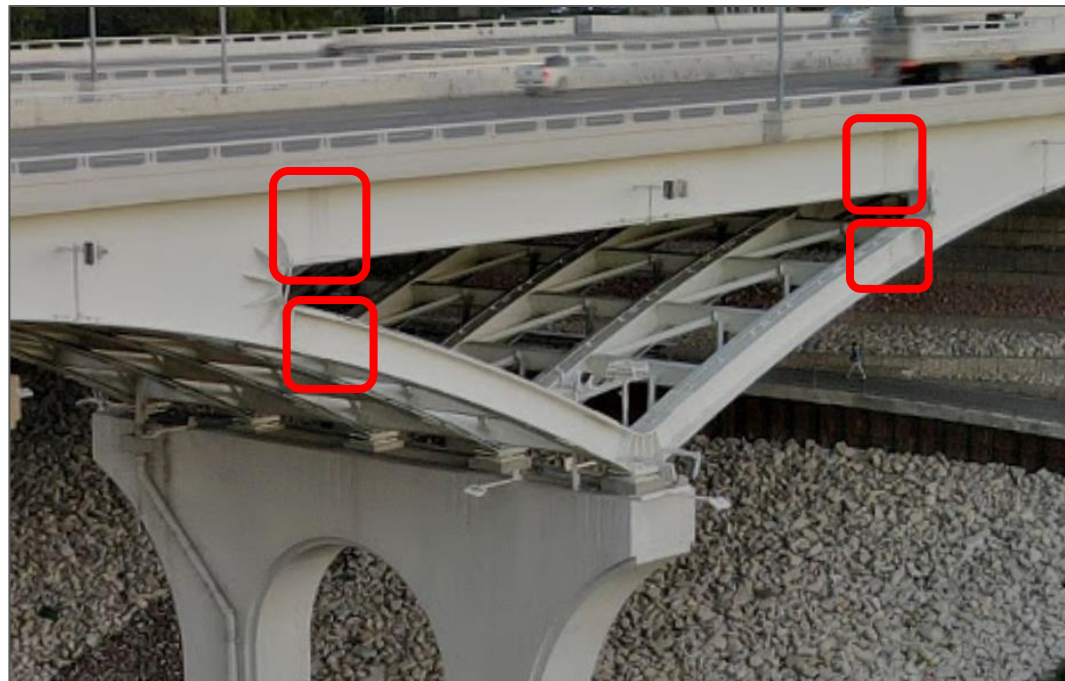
I-90 Innerbelt Bridge, Westbound Girder Configuration (Splice Plates Indicated)
